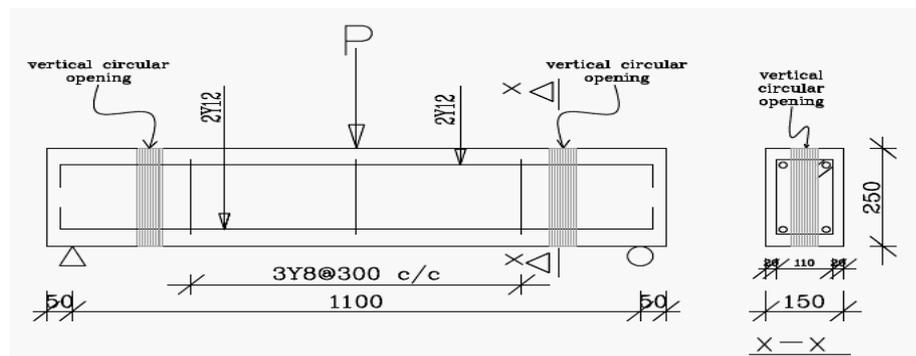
Reinforced concrete beam with openings (Dimensions in mm).
